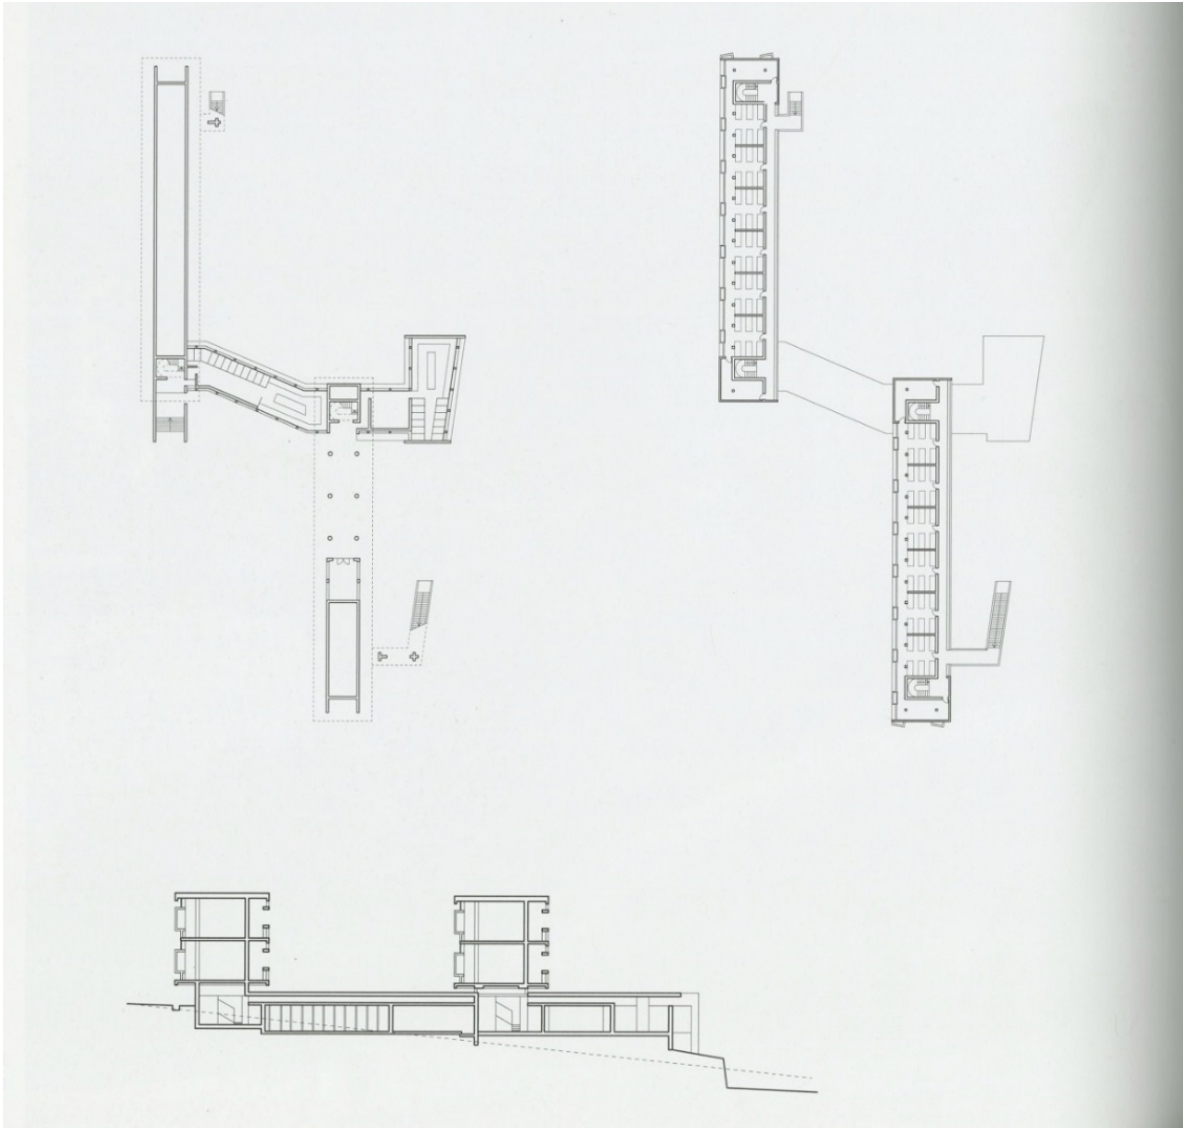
Plan (top) and Section (bottom) of Mfantipsim School Dormitories¹⁹¹
